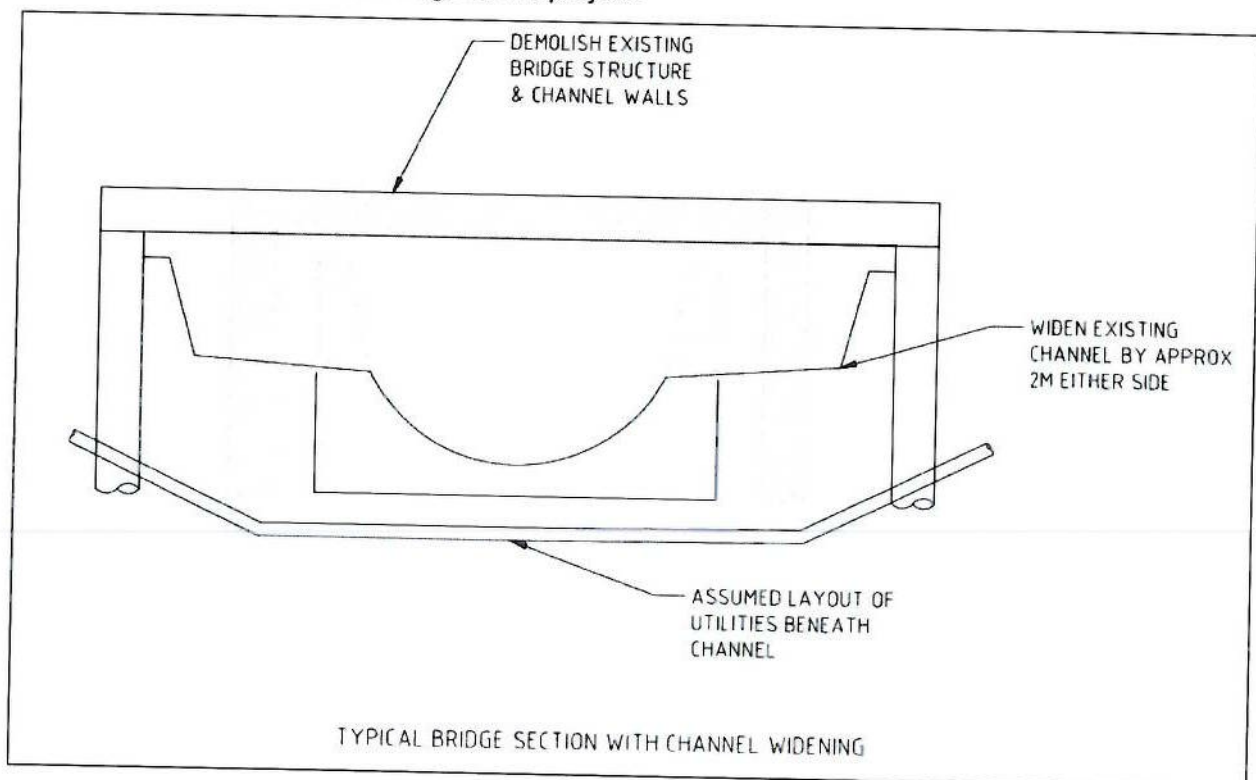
Sketch demonstrating assumed methodology for bridge reconstruction and channel widening works
